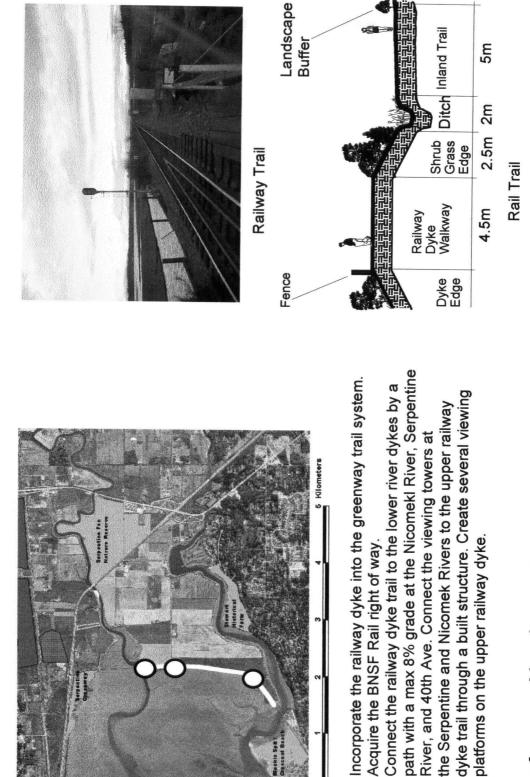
Proposed Serpentine Railway Bridge Improvements 2
